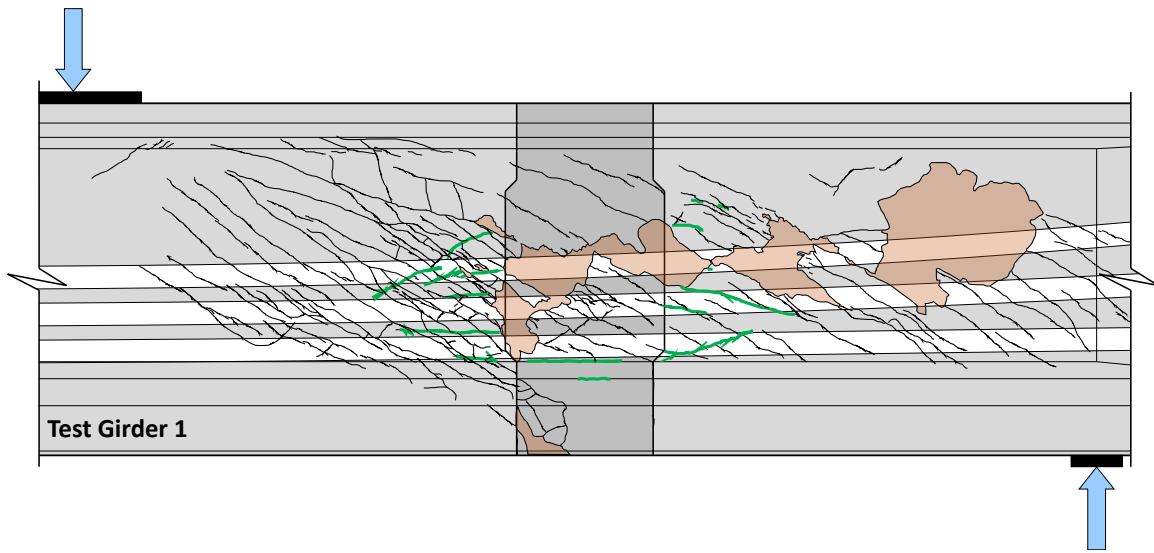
Crack pattern after failure – Test Girder 1
